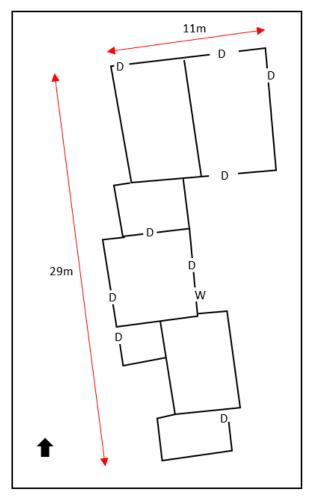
Plan of the house at waypoint 112 in HL02.
